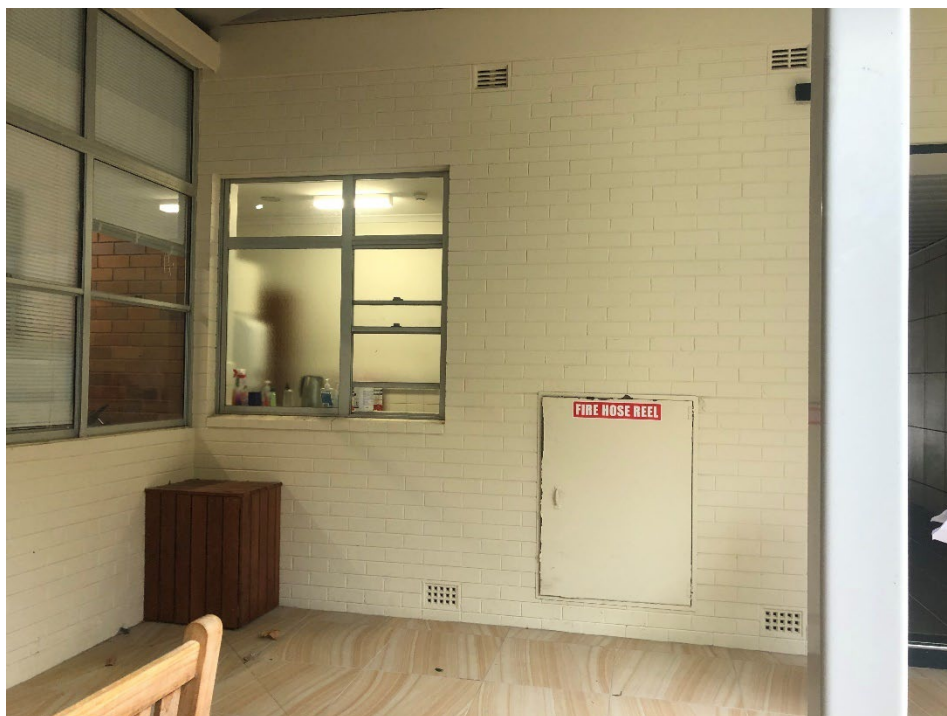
Section of Aikenhead House (constructed 1992) to be demolished to improve connectivity of external green spaces
